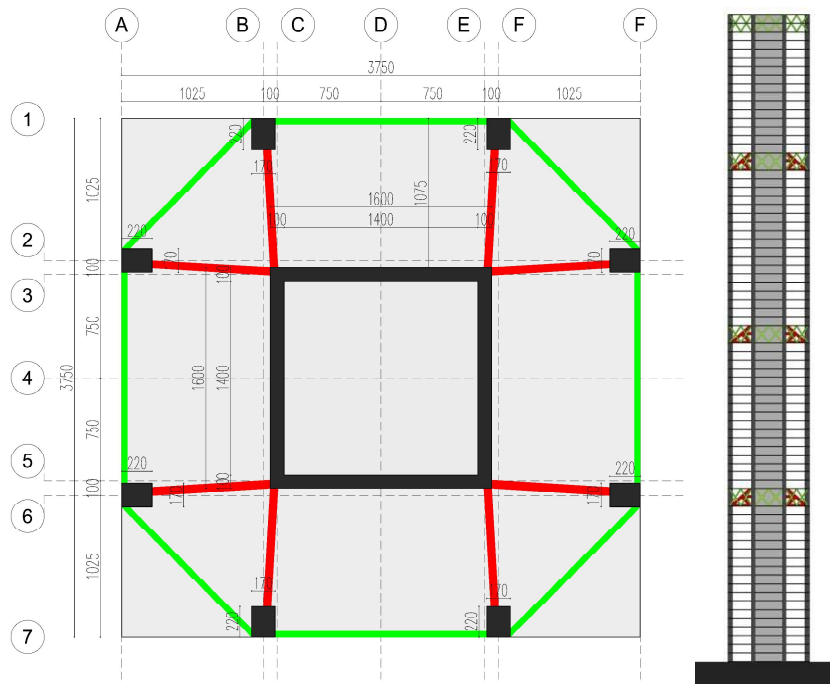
Typical floor plan and elevation of model "OF_OPT_3d" with outriggers and belt trusses
